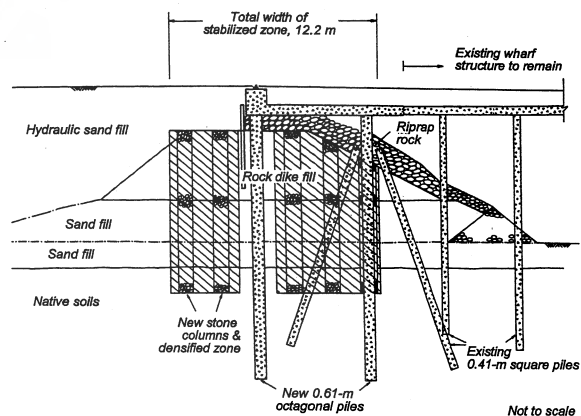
Example of ground improvement for a pile-supported wharf [13]
